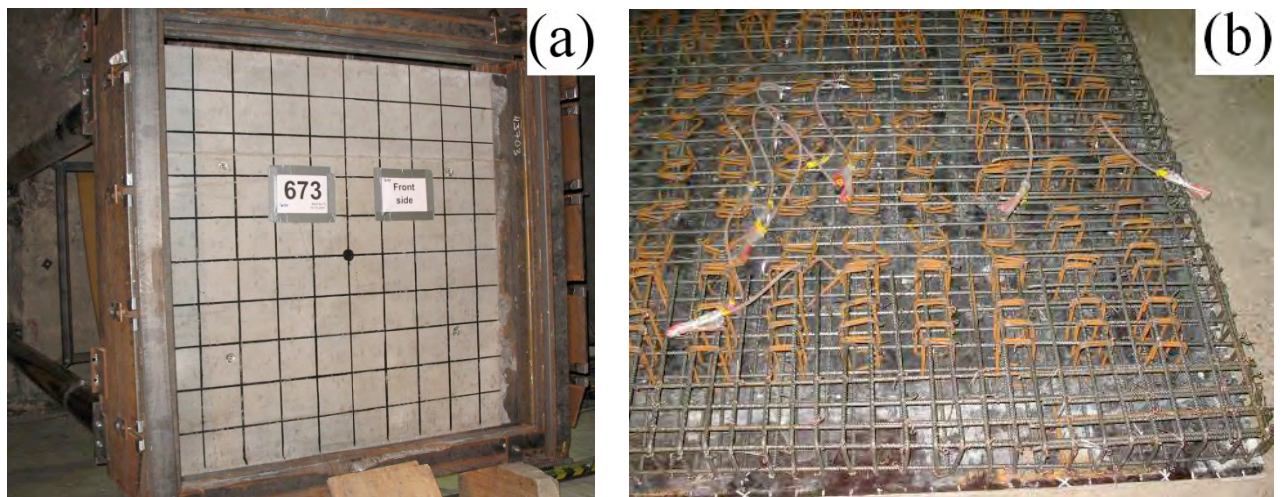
Concrete wall with supporting frame (a) and bending as well as shear reinforcement before casting (b) (pictures provided by VTT).
